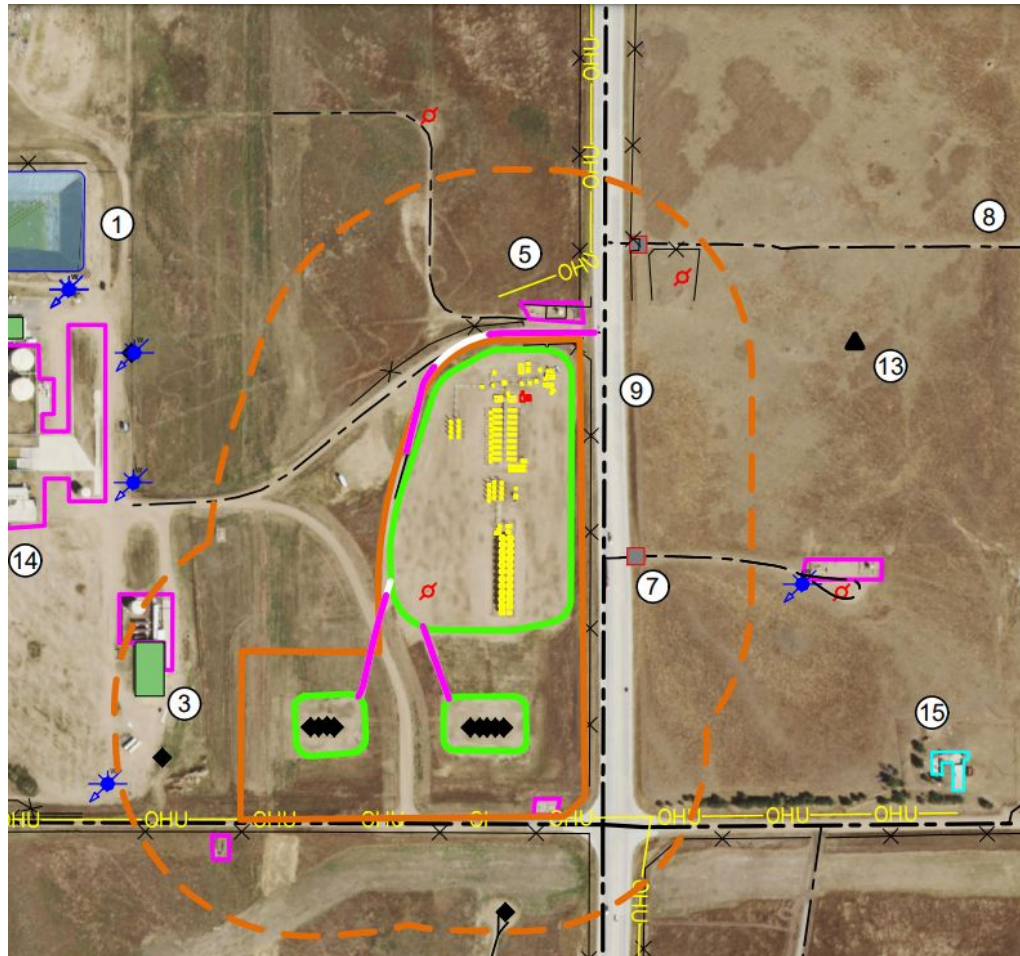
The photo was used from Doc. #402852422 to show the updated location layout drawing that has been approved.
